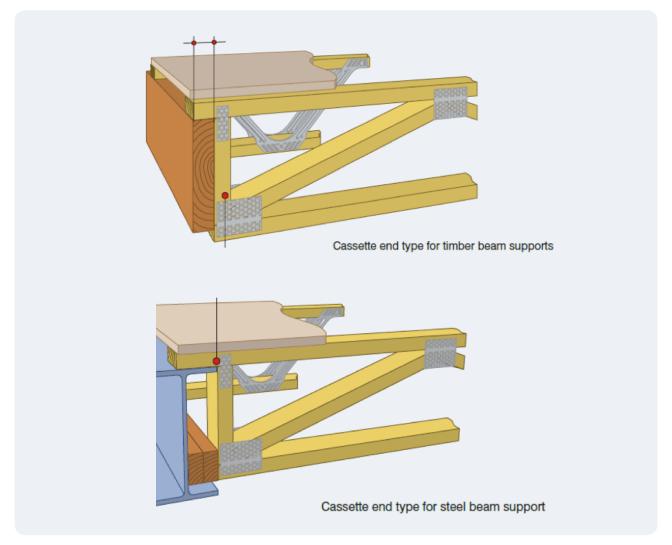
Floor cassette bearing details. (Images: Pryda Floor Cassette Guide)
